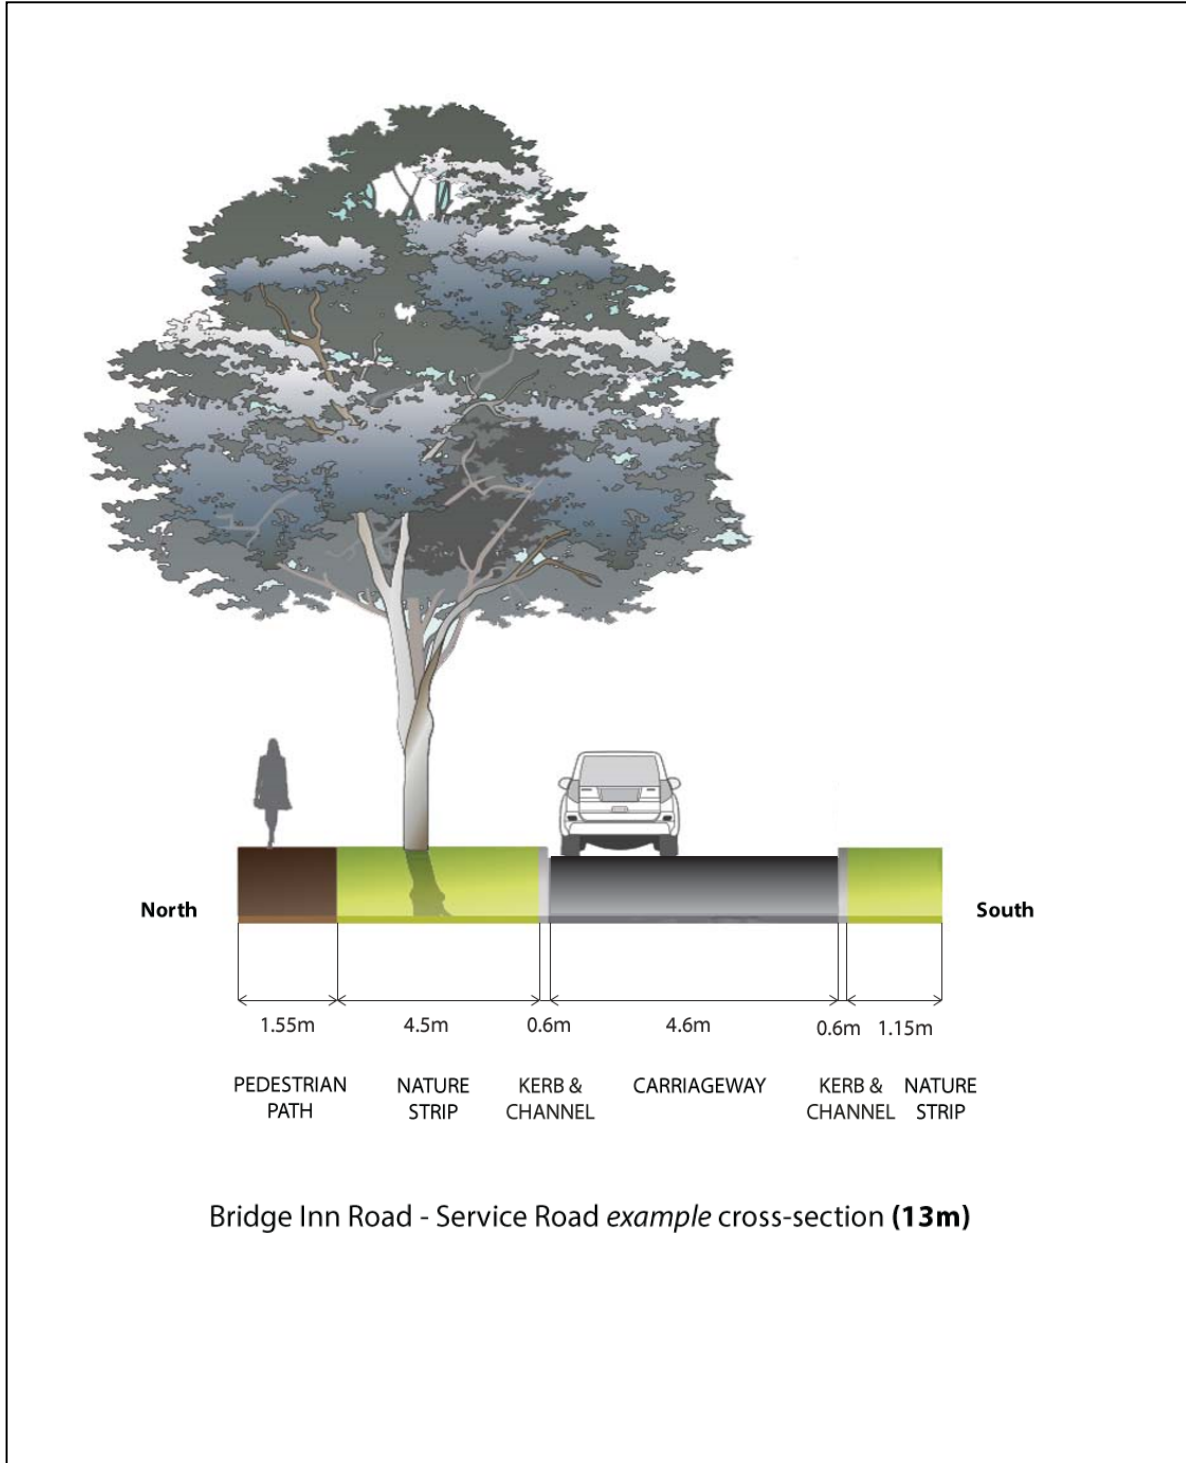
Example of Carriageway Cross Section Profile (Bridge Inn Road Service Road)
